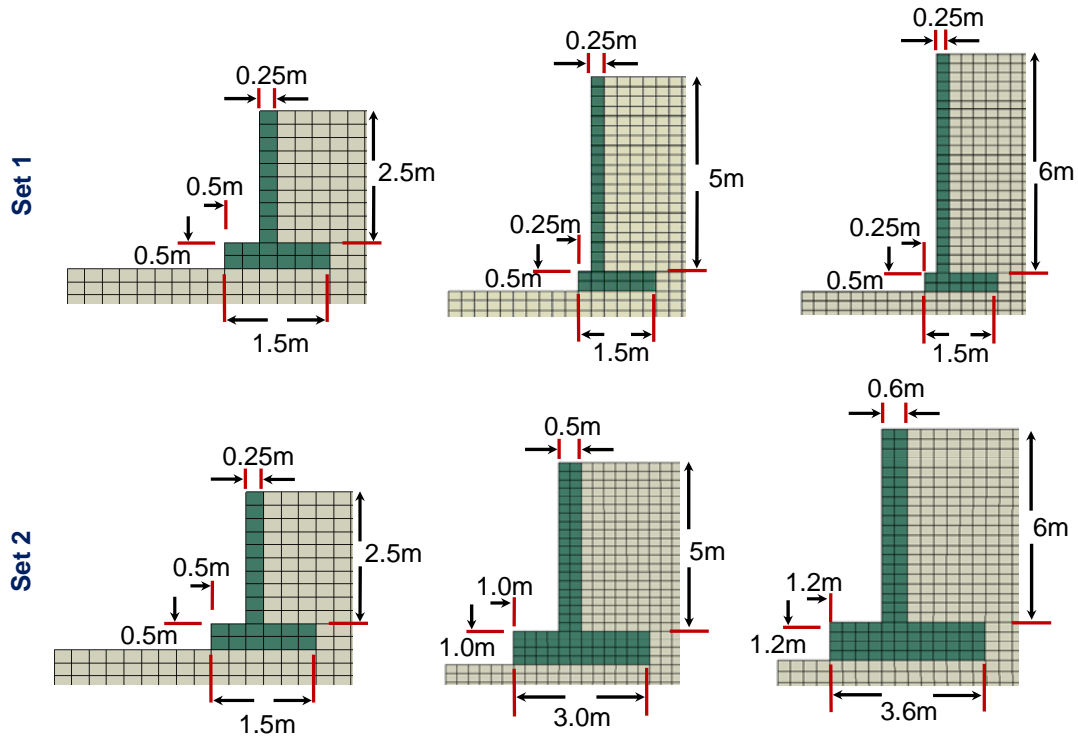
Finite element (FE) models and abutment dimensions in Set 1 and Set 2.
